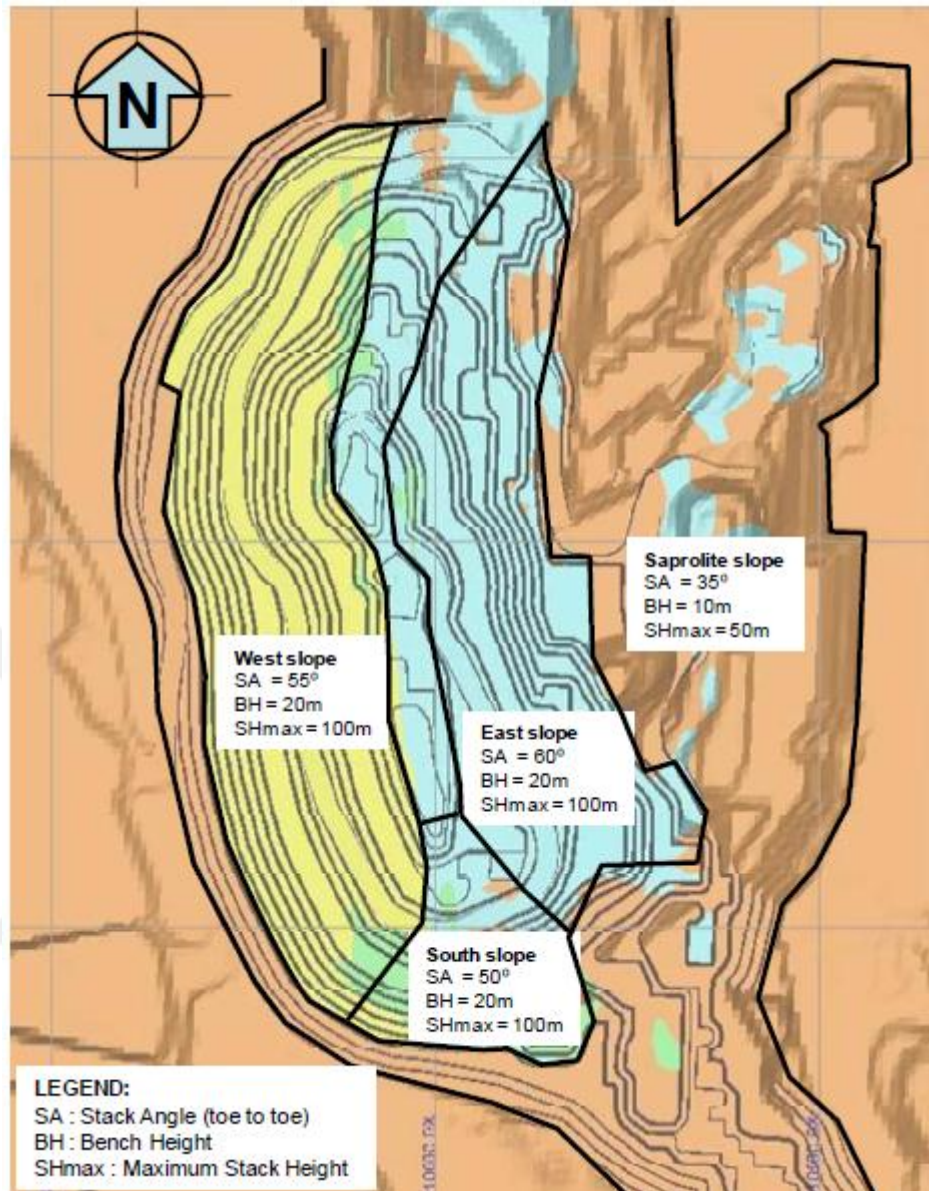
Plan showing recommended pit slope angles (SRK, 2009)
